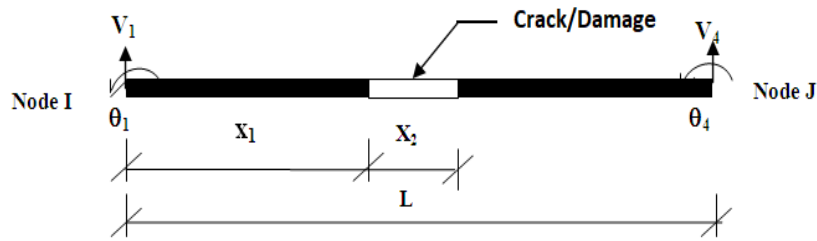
Concrete Beam with a Tensile Crack at the center
